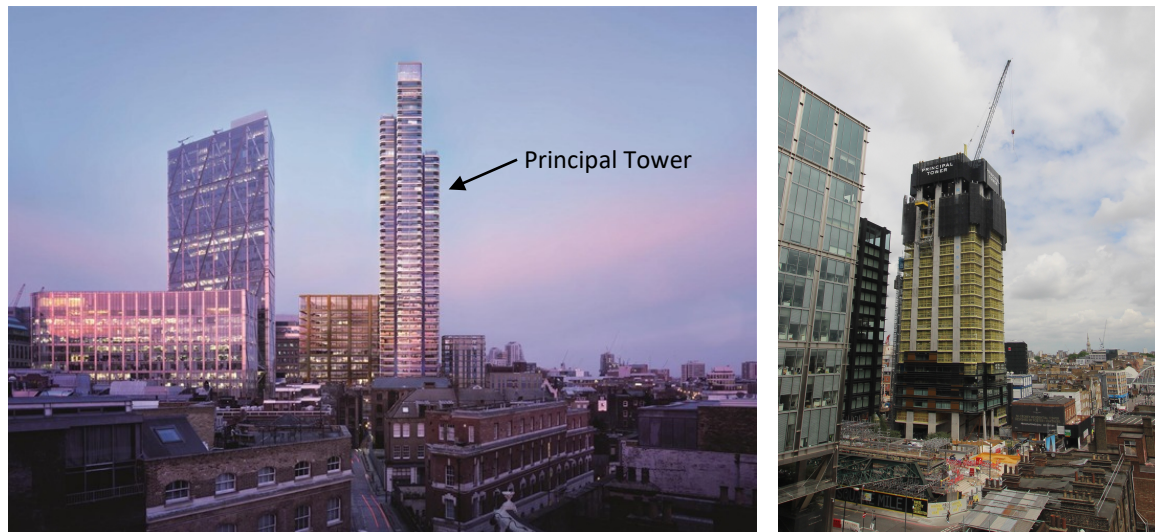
Principal Tower: illustration showing the design of the tower (left), and the tower currently under construction (right).
